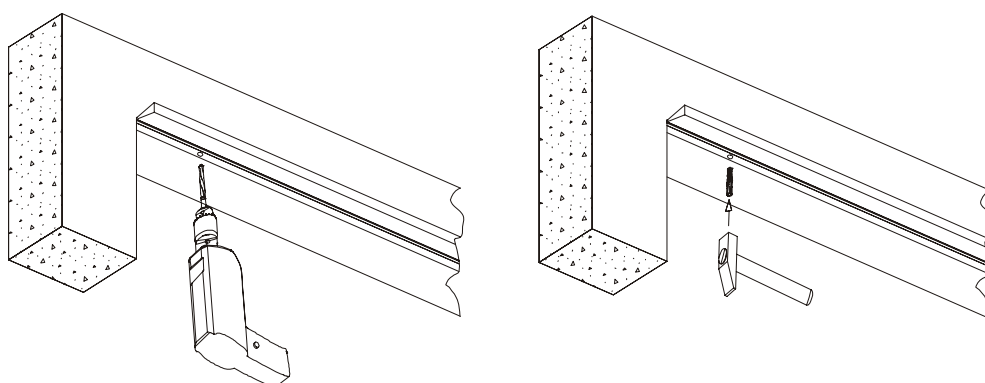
Drill the mounting holes in the lintel and fit the wall plugs.
